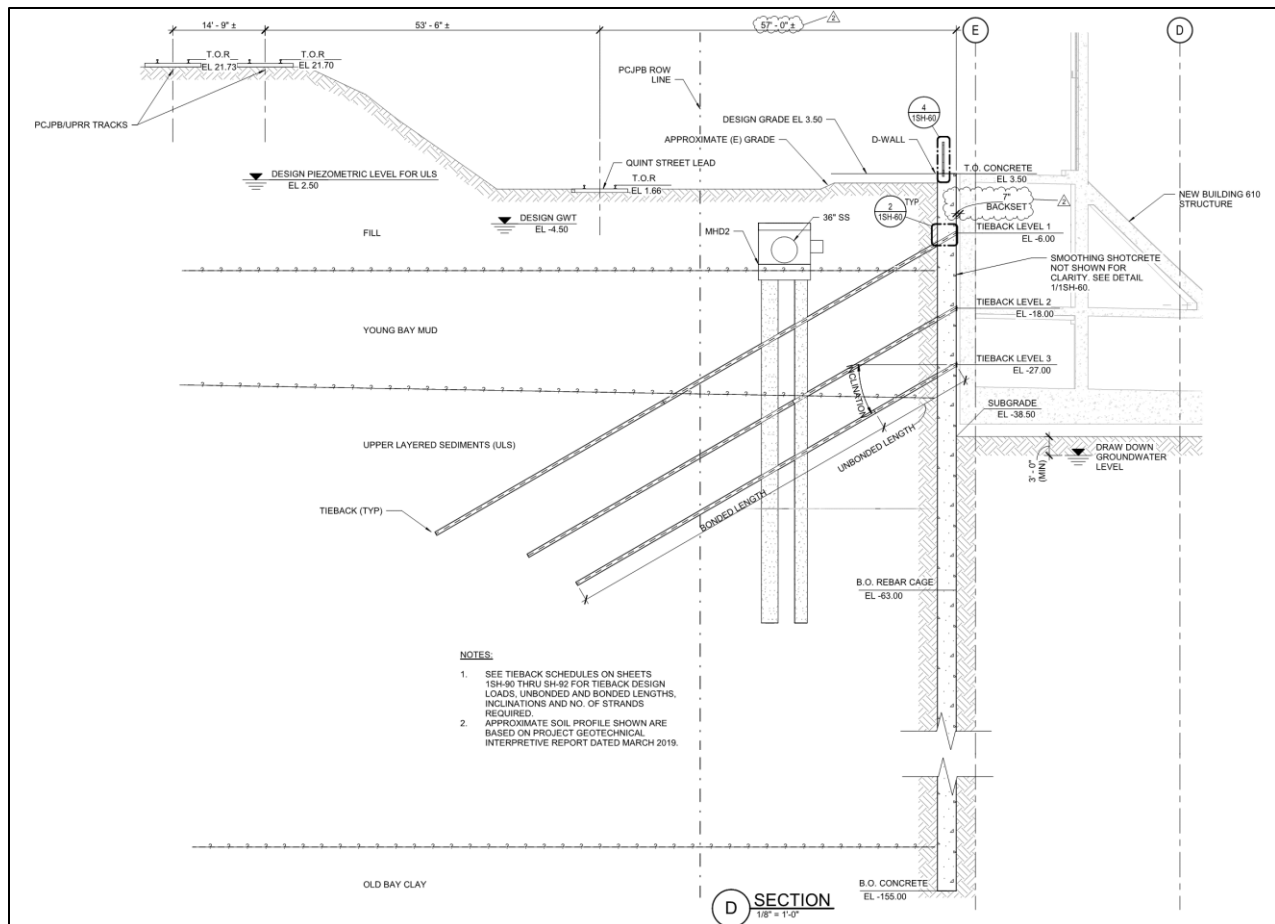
Typical west wall section of D-Wall Shoring System with tiebacks
